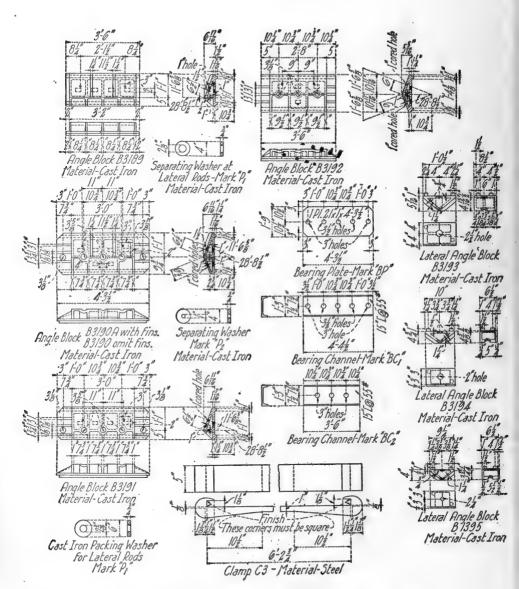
Iron Details for 150 ft. Span, Howe Truss Span. C. M. & P. S. Ry.
